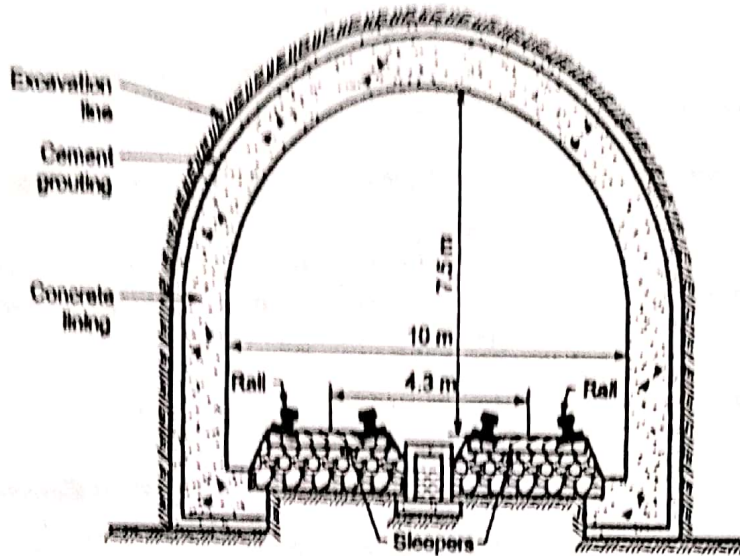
Cross-section of tunnel for a double line broad gauge railway track
